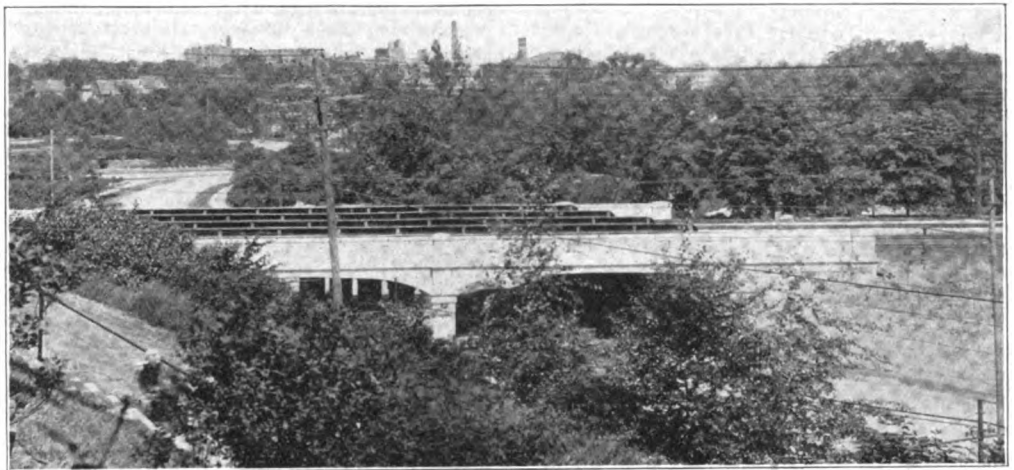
Cedar Ave. Bridge—Plate Girders Masked by Concrete.
